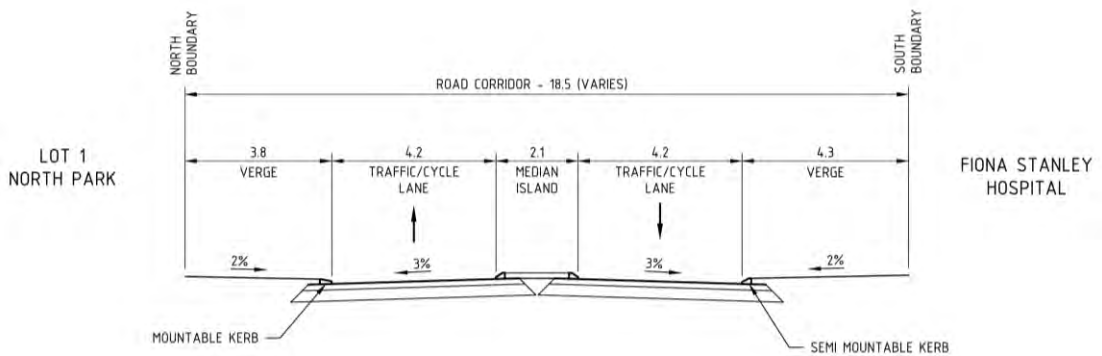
Section D-D Fiona Wood Road- (North of Barry Marshall Parade)
